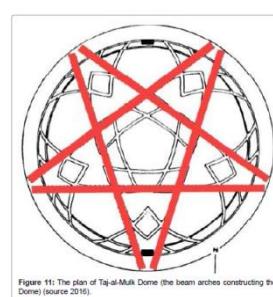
The plan of Taj-al-Mulk Dome (the beam arches constructing the Dome) (source 2016).
